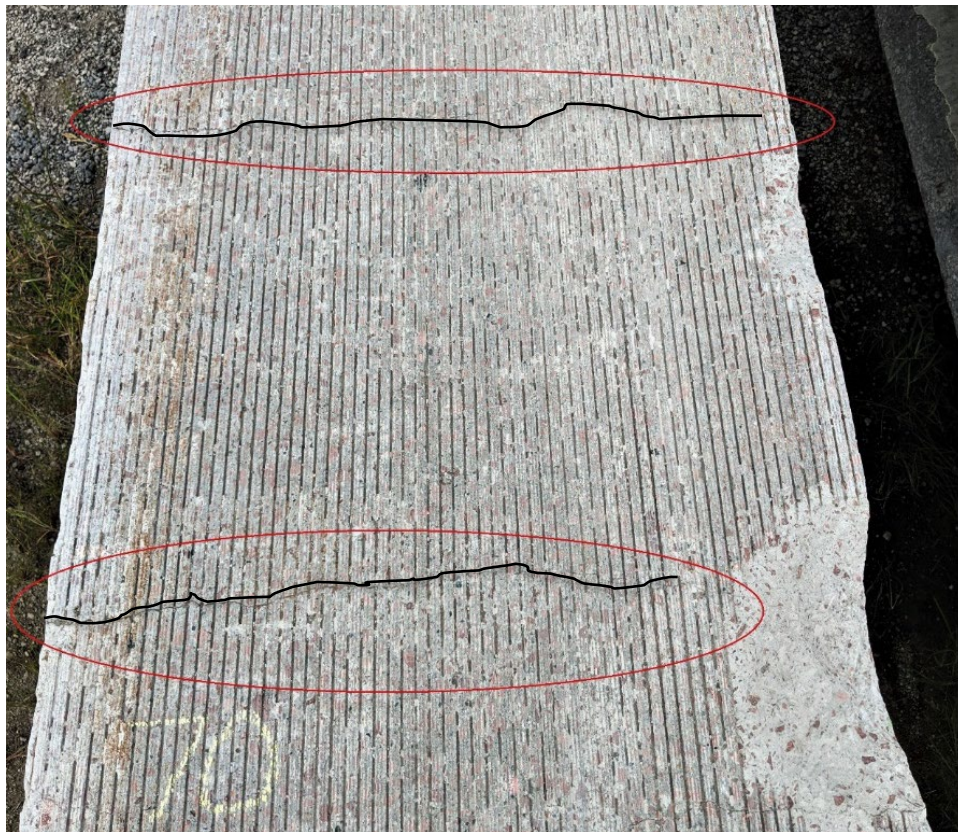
Typical deck surface cracking observed on Girder B
